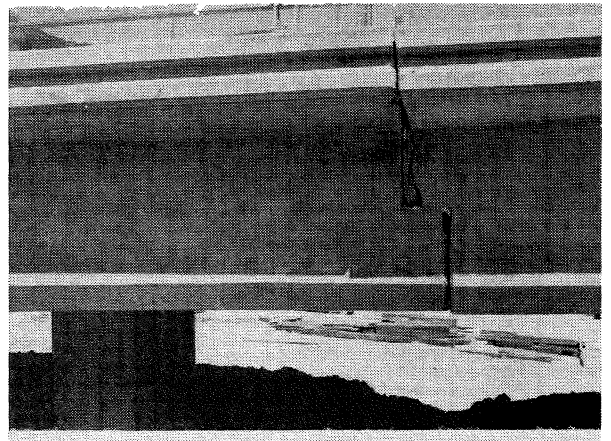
The hinge-joint near Column 9, South Connector Overcrossing. Both joints on the remaining western section were damaged by pounding.
